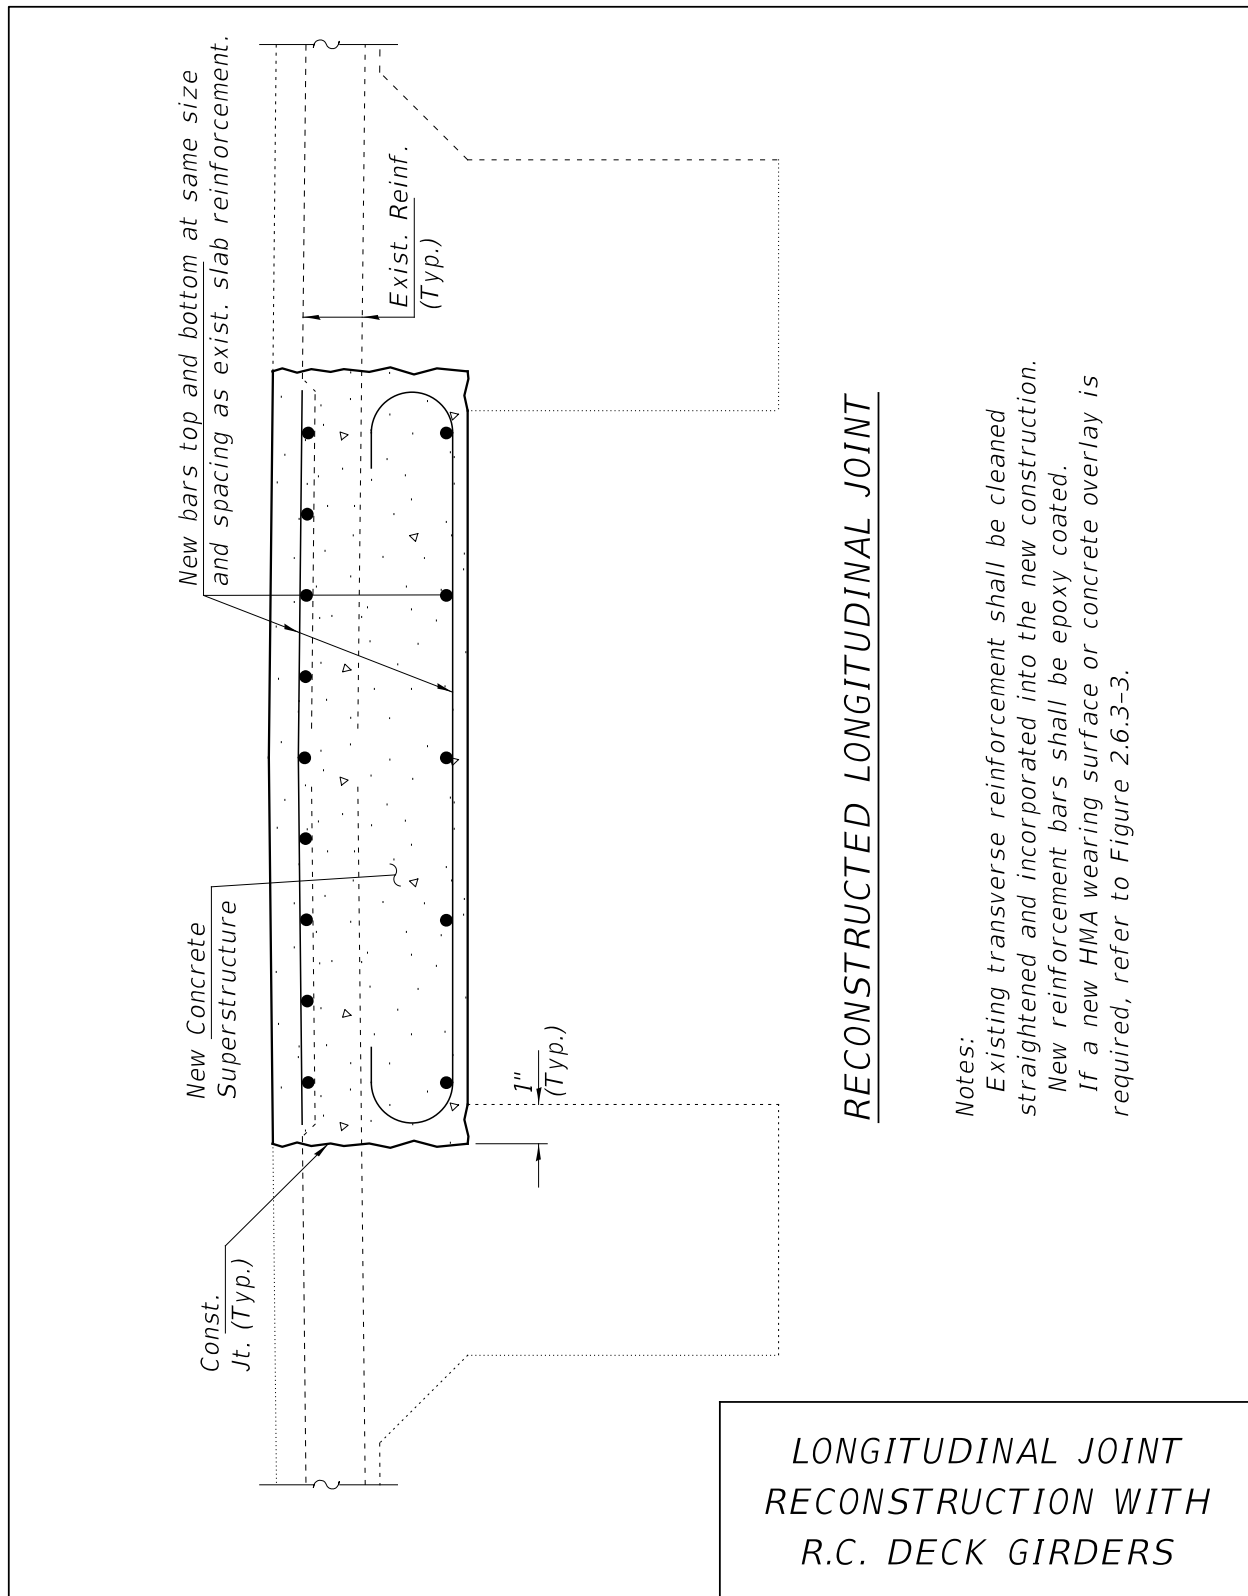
Longitudinal Joint Reconstruction with R.C. Deck Girders
